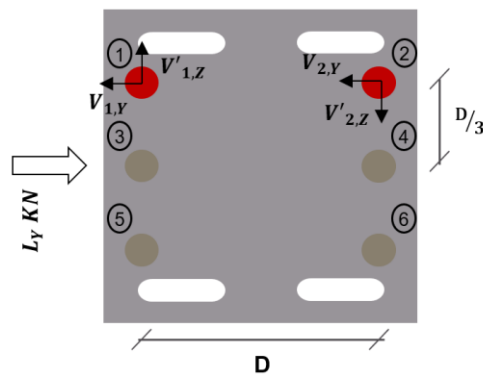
Scheme of the force in the activates fasteners, when applying only horizontal load.
